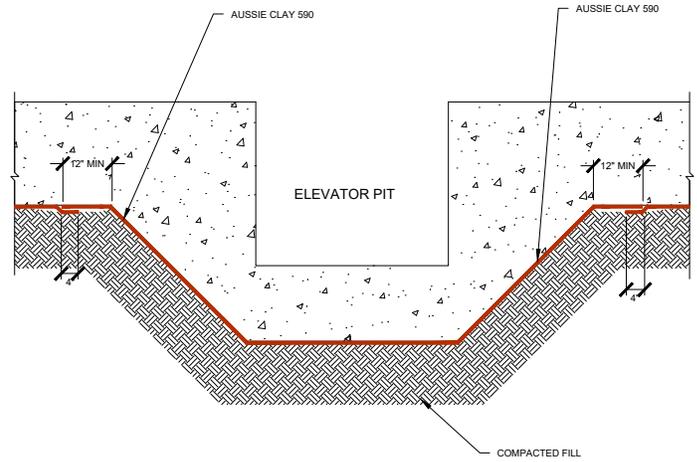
TYPICAL ELEVATOR PIT
